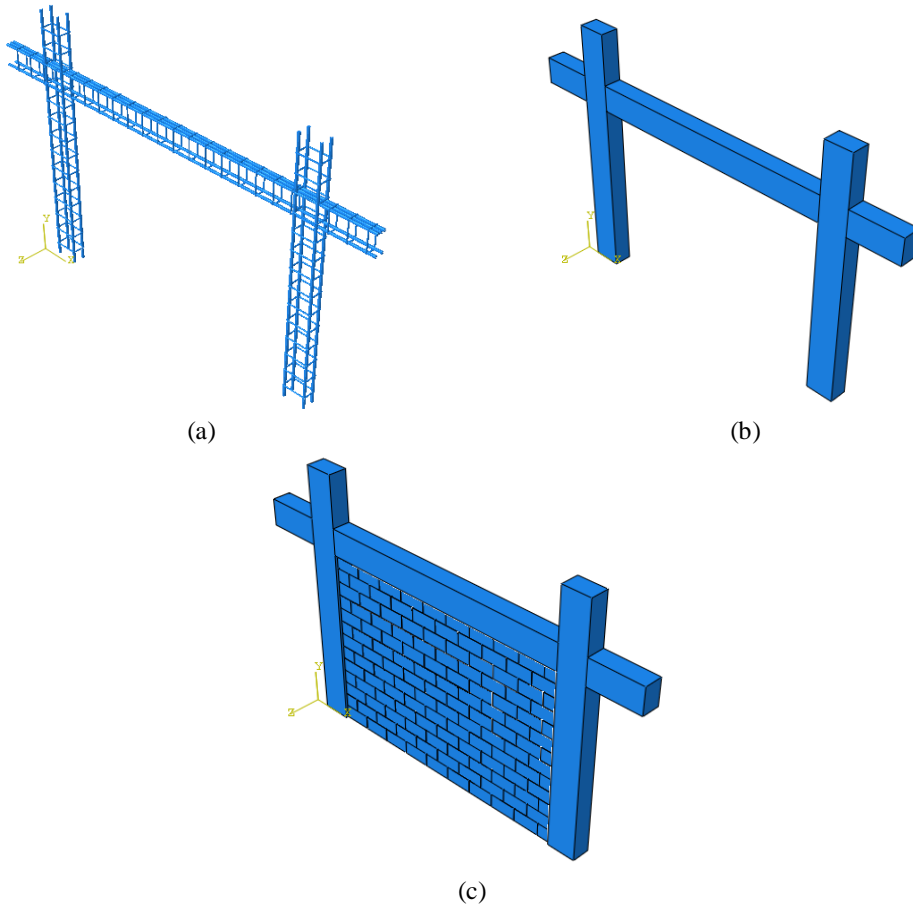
The finite element model details (a) Longitudinal and transverse reinforcement (b) Bare frames (c) Infilled frames
